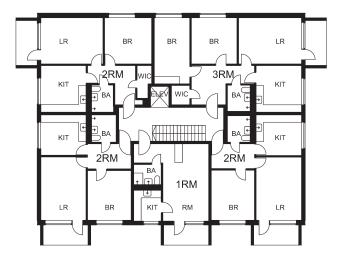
An original plan of a 7-floor point block. Adapted from documents courtesy of Harri Hagan.
